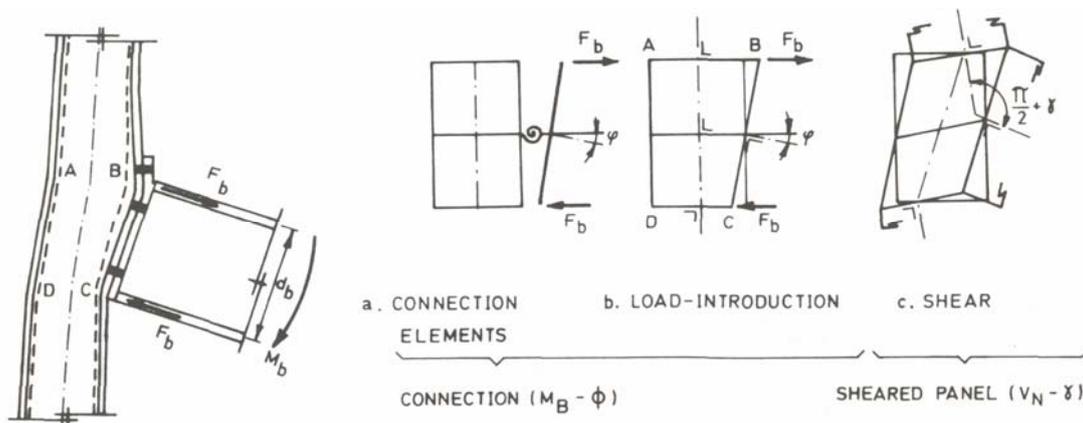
deformation of a single-sided beam-to-column joint configuration & main components of joint deformability
